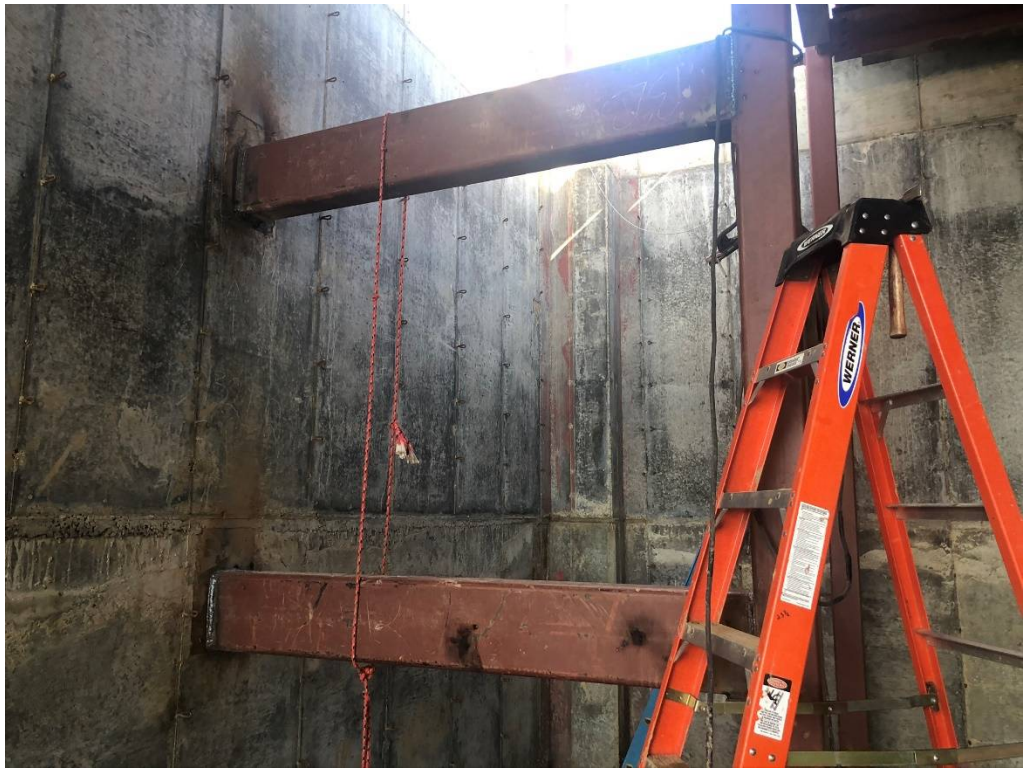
Elevator Shaft Horizontal Supports Welded to Embedded Plates
